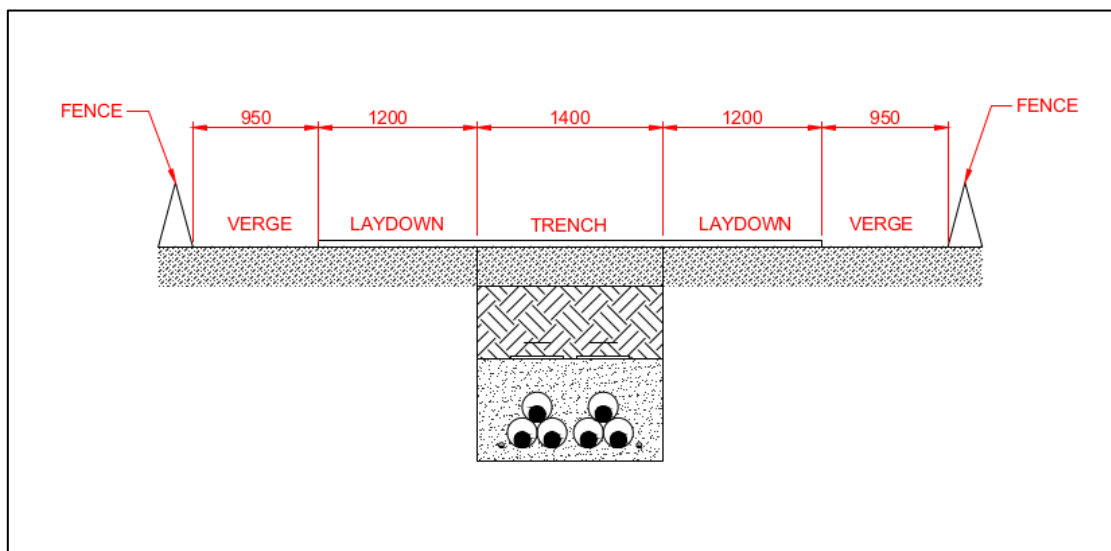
Cross-sectional diagram of example cable arrangement for installation in a single lane road
